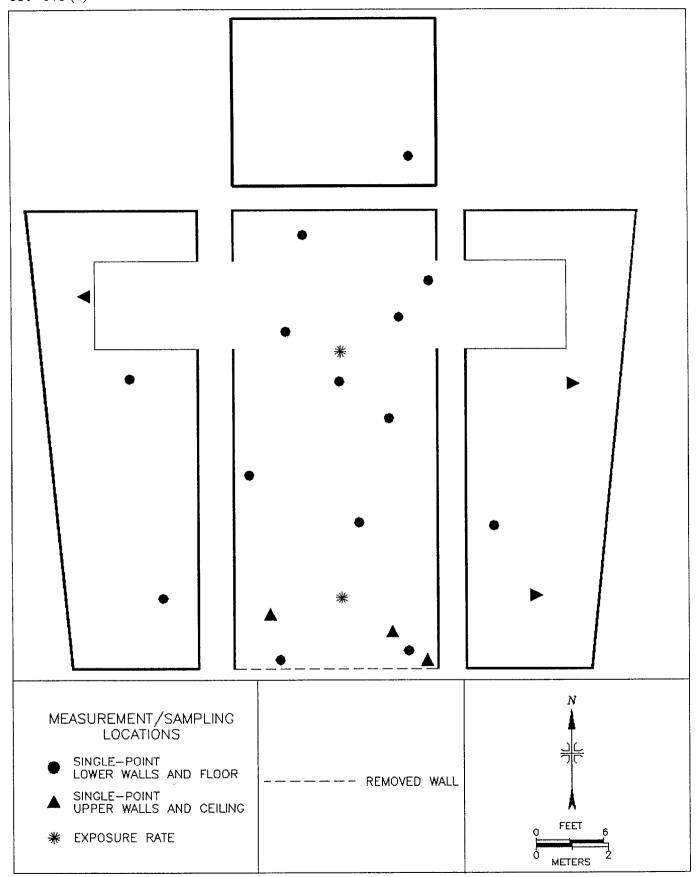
North Building, Area 7 — Measurement and Sampling Locations
